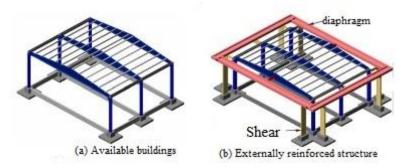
Building models reinforced with external shear diaphragm with the existing structure, Source: Kaplan and others, 2009.
